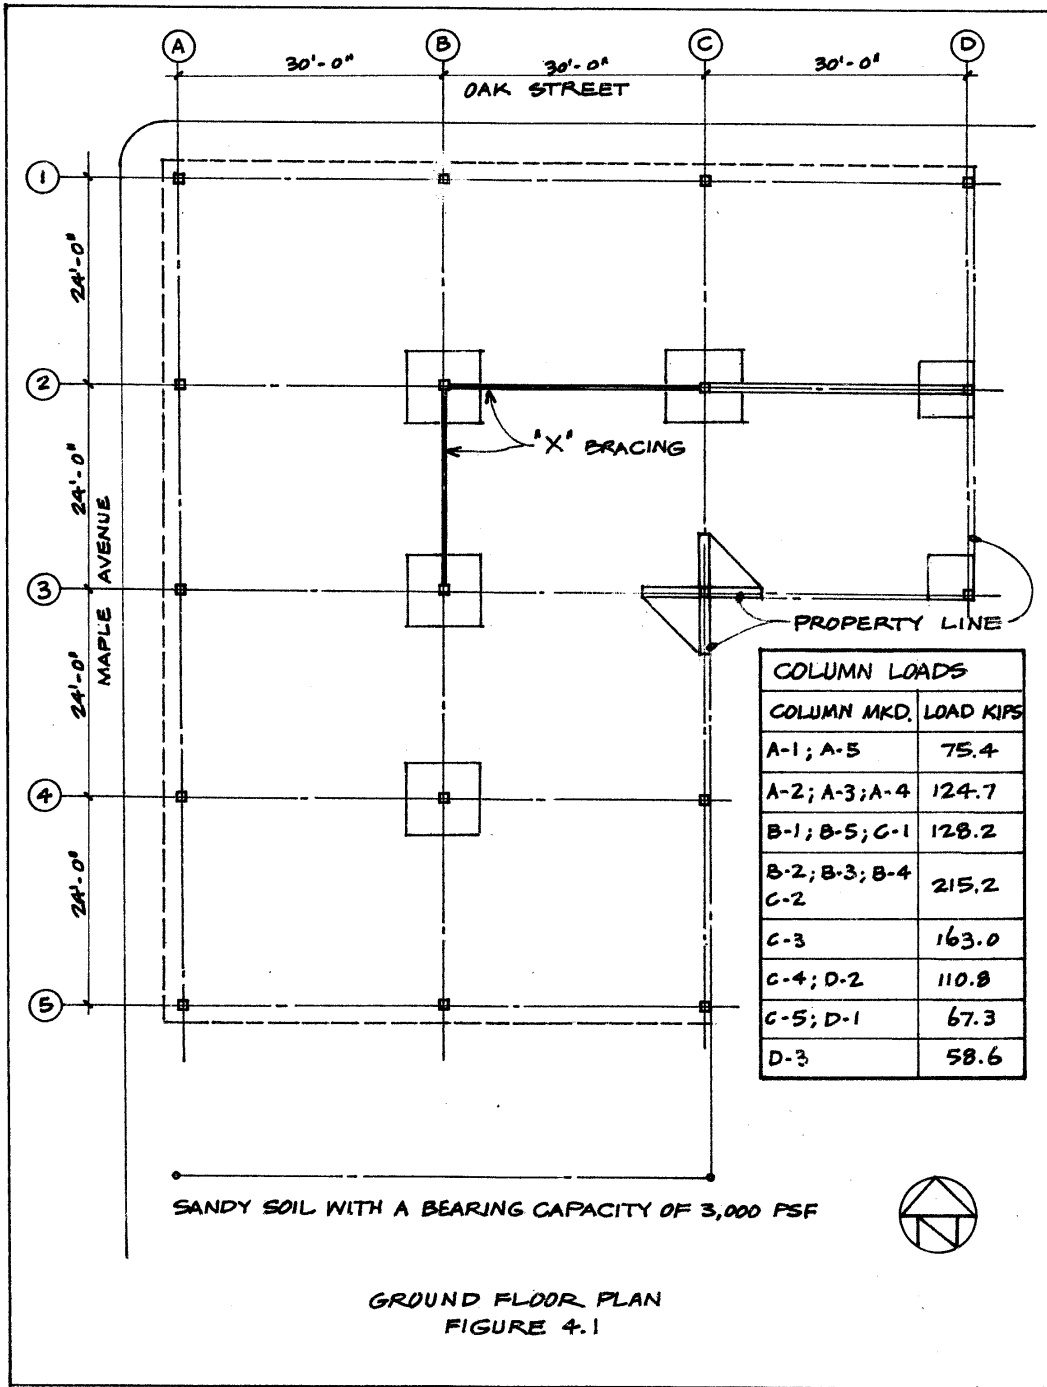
shows a two storied corner commercial building located in the downtown area at the intersection of Maple Avenue and Oak Street in a typical American town. It depicts an assumed ground floor column layout carried by a particular mix of concentric and eccentric spread footing conditions which may represent a good probability of occurring situations that the structural or foundation engineer may find in his/her daily routine design work assignments. Please also notice we have assumed a sandy soil with an allowable soil bearing capacity of 3,000 pounds per square foot.
